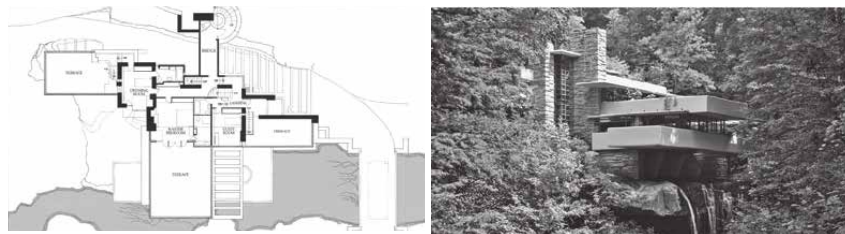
Schematic drawings of Frank Lloyd Wright designs of the Kaufmann house (Fallingwater house) built in 1939. Left - Second Floor. Right - Elevation Photography. As a typical example of his ideas of organic modeling, Wright does not place any centrality to organize activities or elements but rather achieve coherent modeling by aggregating them altogether. There is barely a center to be found that is not occupied or dissolved. And one cannot really speak of elevated facades for such aggregated wholes either. Sources: Adelyn Perez. "AD Classics: Fallingwater House / Frank Lloyd Wright" 14 May 2010. ArchDaily. Accessed 11 Aug 2022. Knight, Caroline. Frank Lloyd Wright. Parragon Publishing, 2005.
